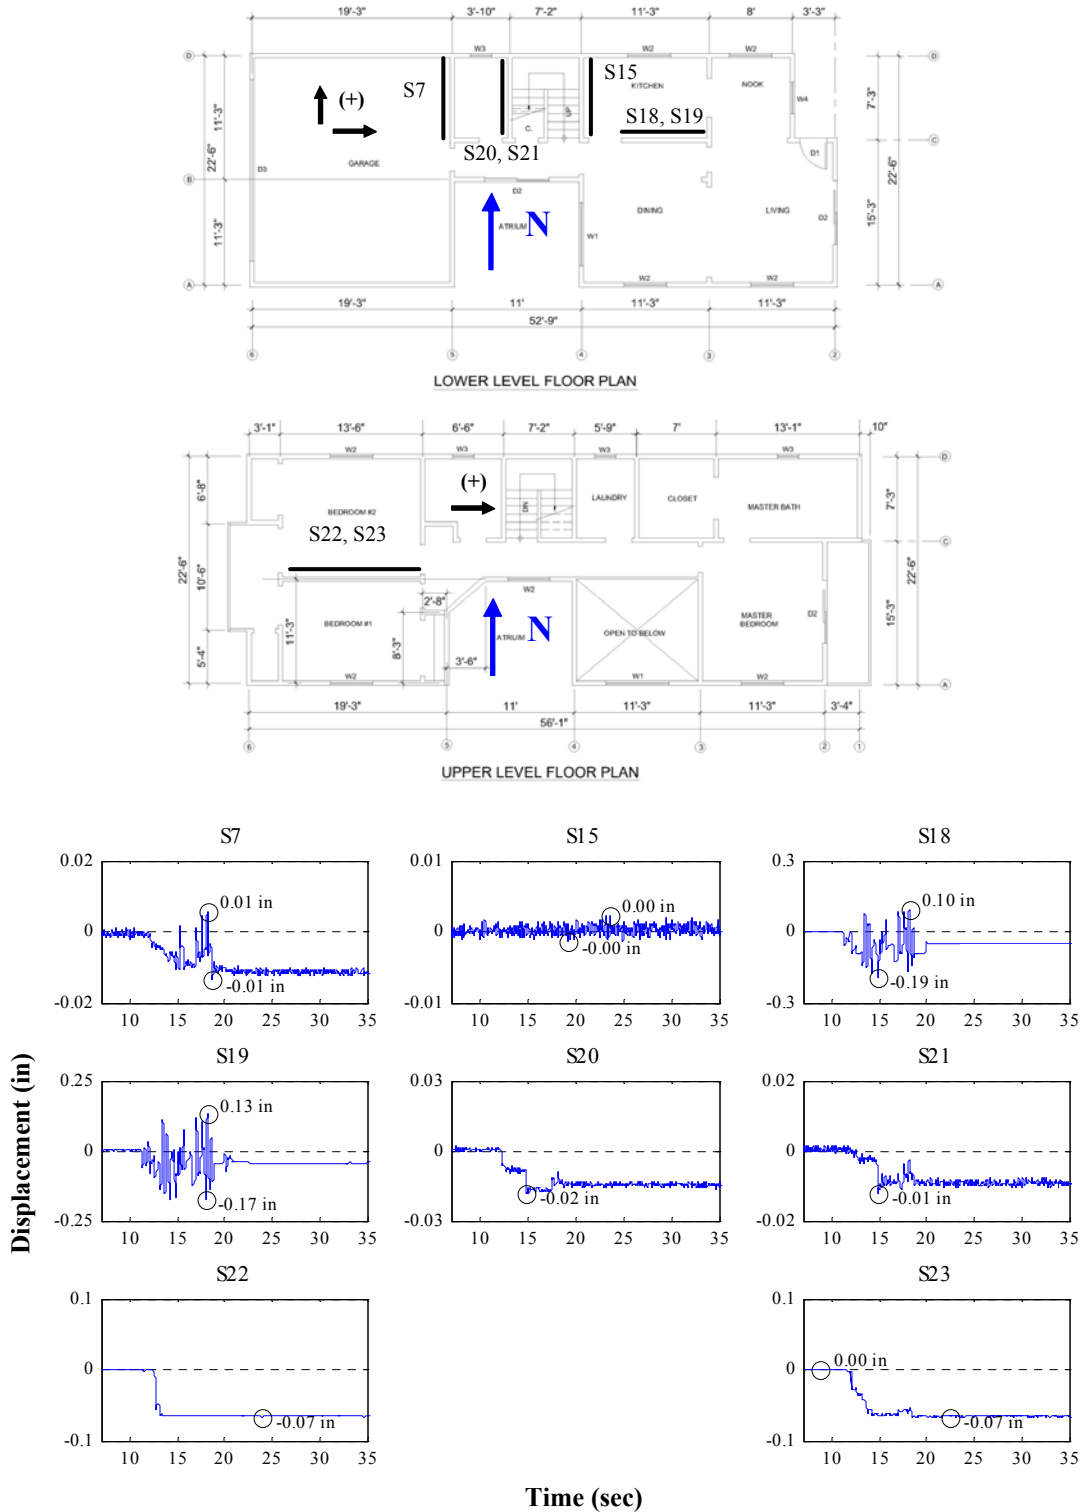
Wall deformations of internal walls for Test NWP1S07
